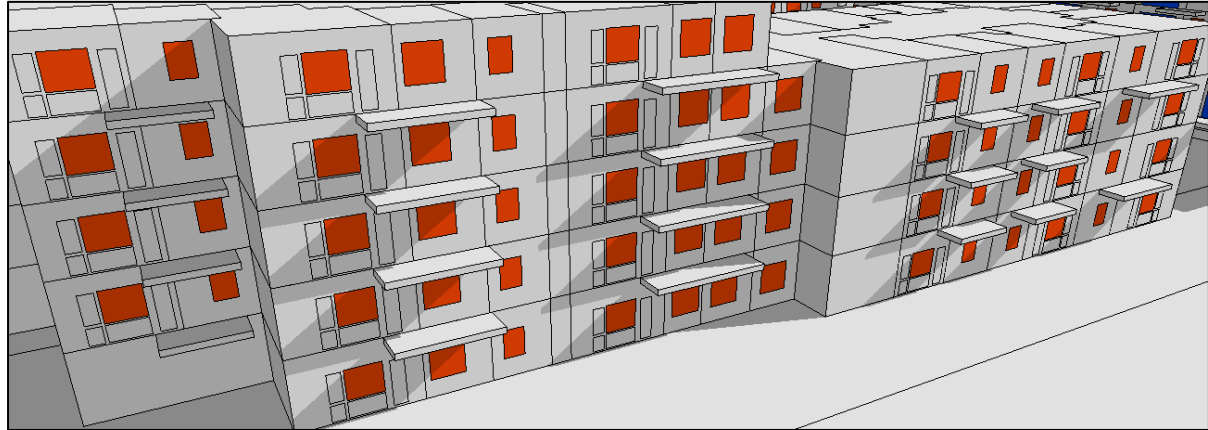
Windows achieving 1.5 hours of sunlight - Southwest elevation of Building 09 (modelling software)
